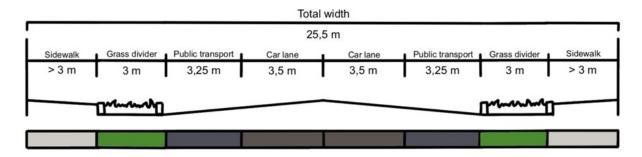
Width and structure of cross section with grass dividers between vehicle lanes and sidewalks. (Made by: Susanna Hsu Hals)
